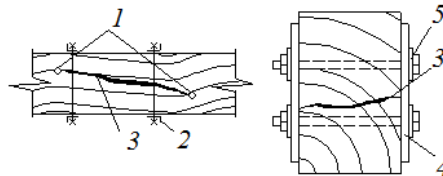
Local strengthening of beams: longitudinal cracks [12]:
